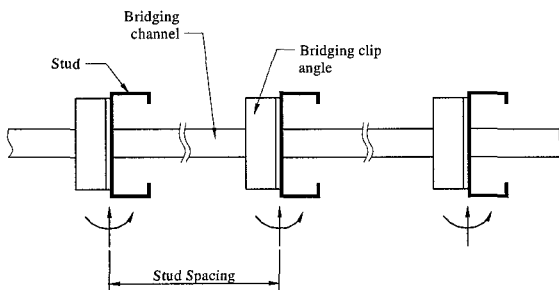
Curtainwall Studs Braced by Bridging Channel
